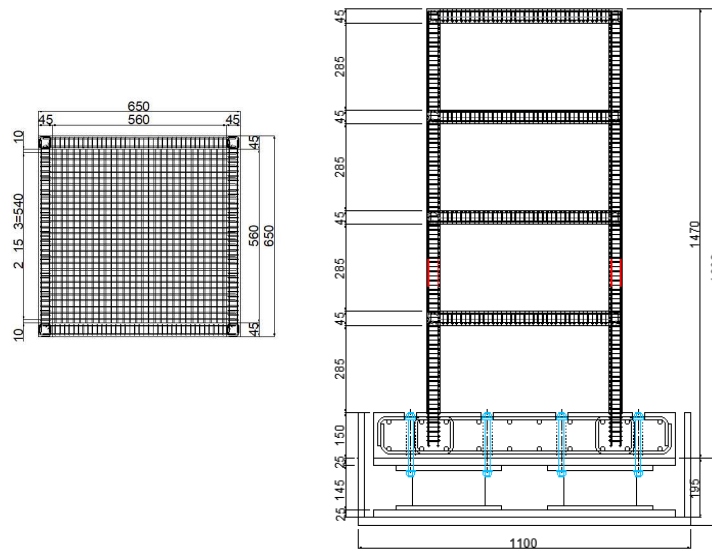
Plan and elevation of the test specimen (unit mm)
